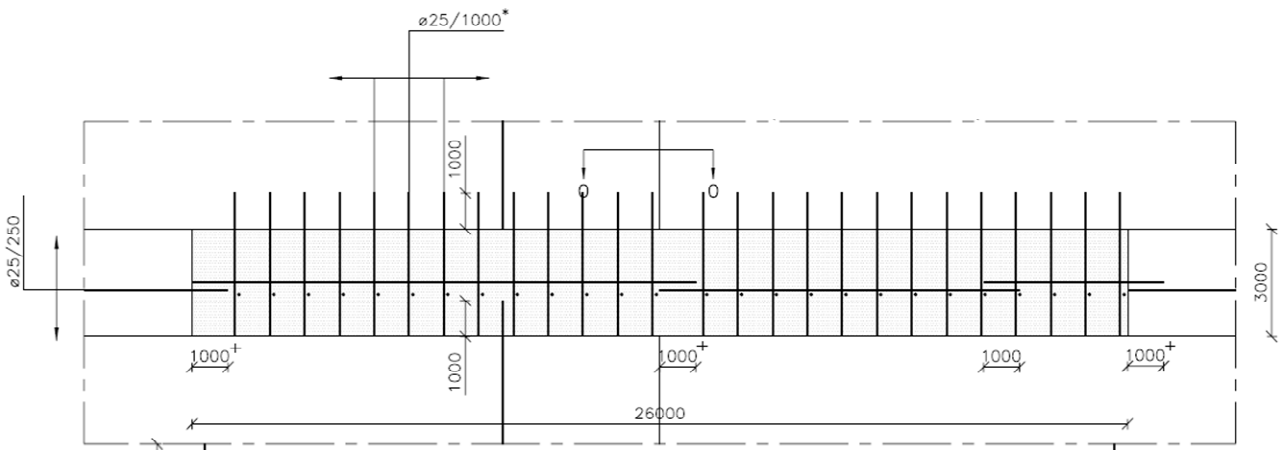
Arrangement of reinforcement 'wall' in global y-z-plane (transverse) for the Calabrian anchor block.
